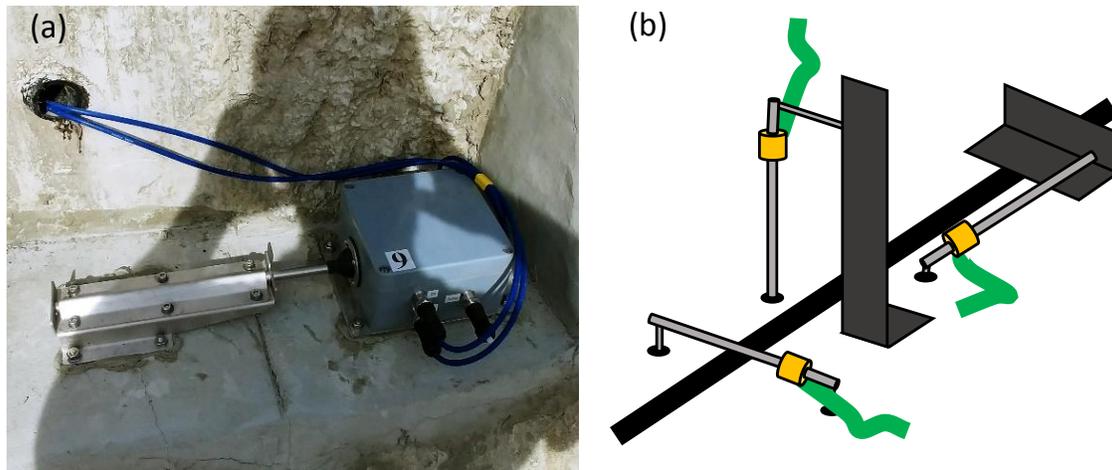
(a) Pico-tec jointmeter (b) traditional 3D jointmeter
